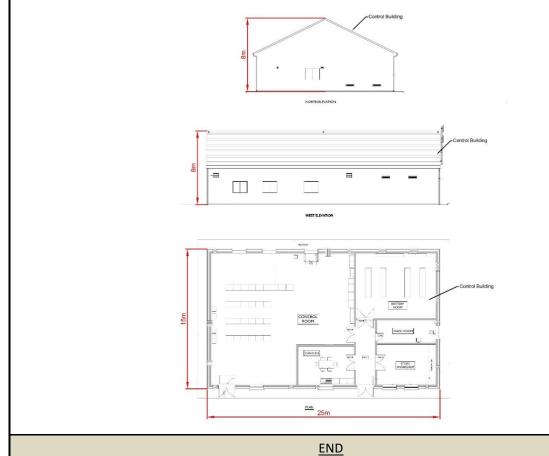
Plan and Elevation of the Control Building at Mountphilips Substation
